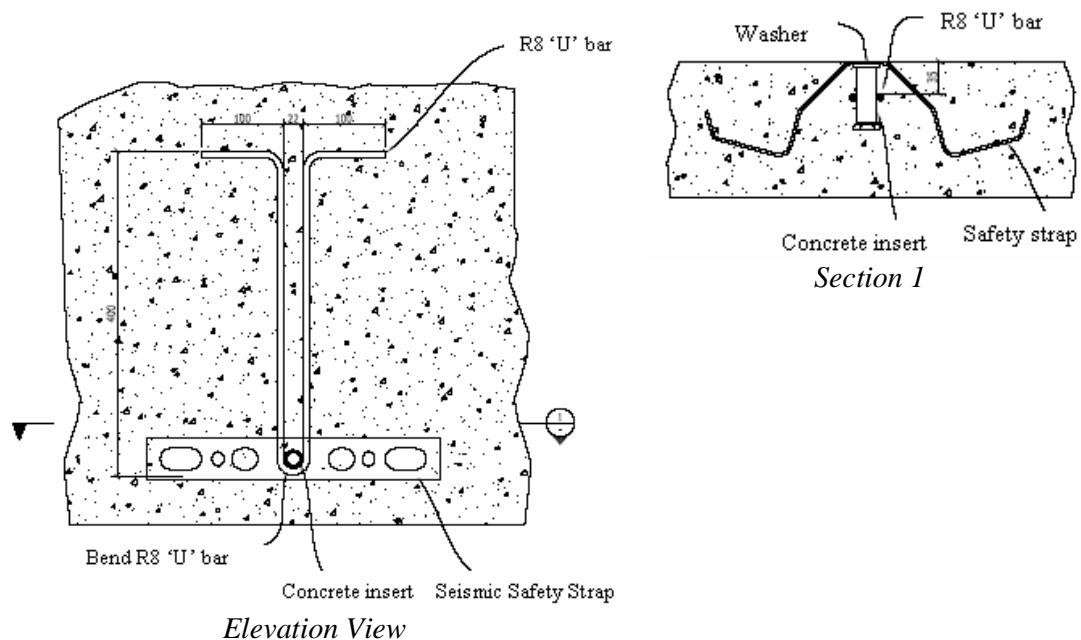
Additional reinforcing 'U' bar to concrete insert (Courtesy of Structex Limited)
